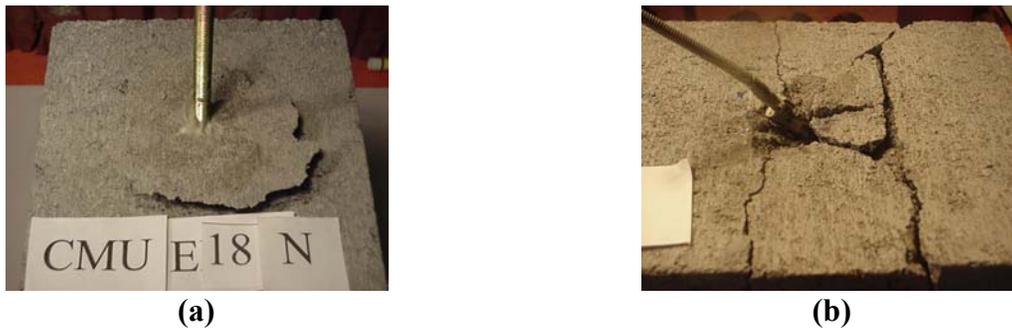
Failure Modes of Concrete Masonry Block
